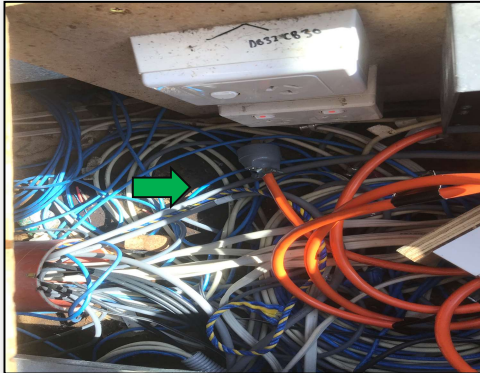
Level 32, internal, bar sitting area under flooring - non-asbestos bituminous membrane.
